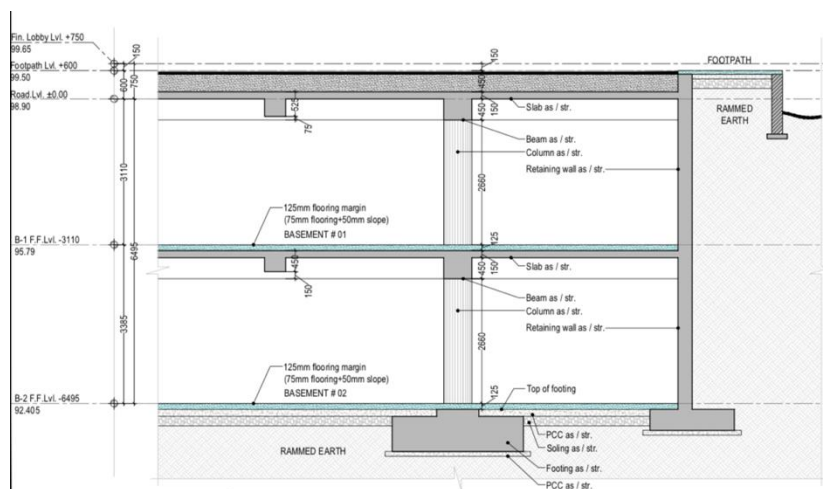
Proposed section of multi- level parking at Chaugan Stadium, Source: Eptisa
